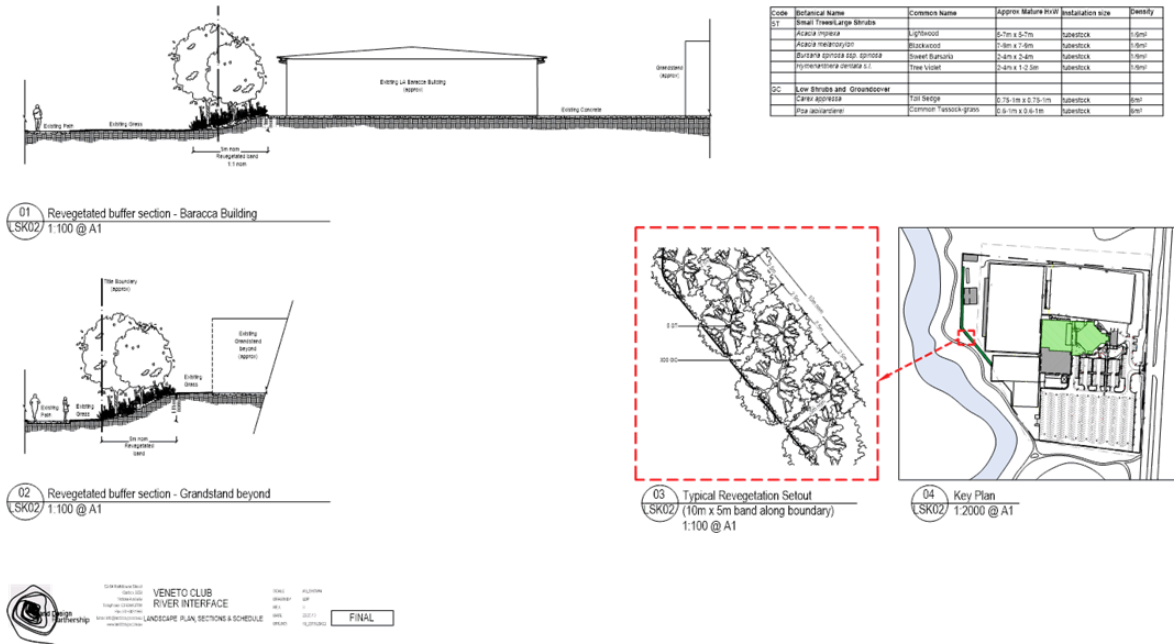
+ 15 - Proposed Landscape Sections along river boundary
